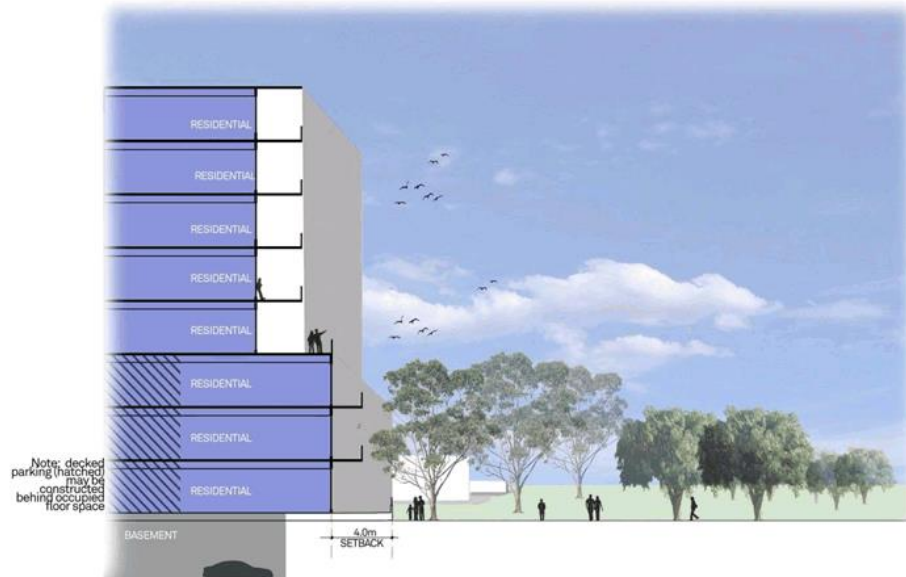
\_Typical cross section of high density residential directly adjoining public open space
